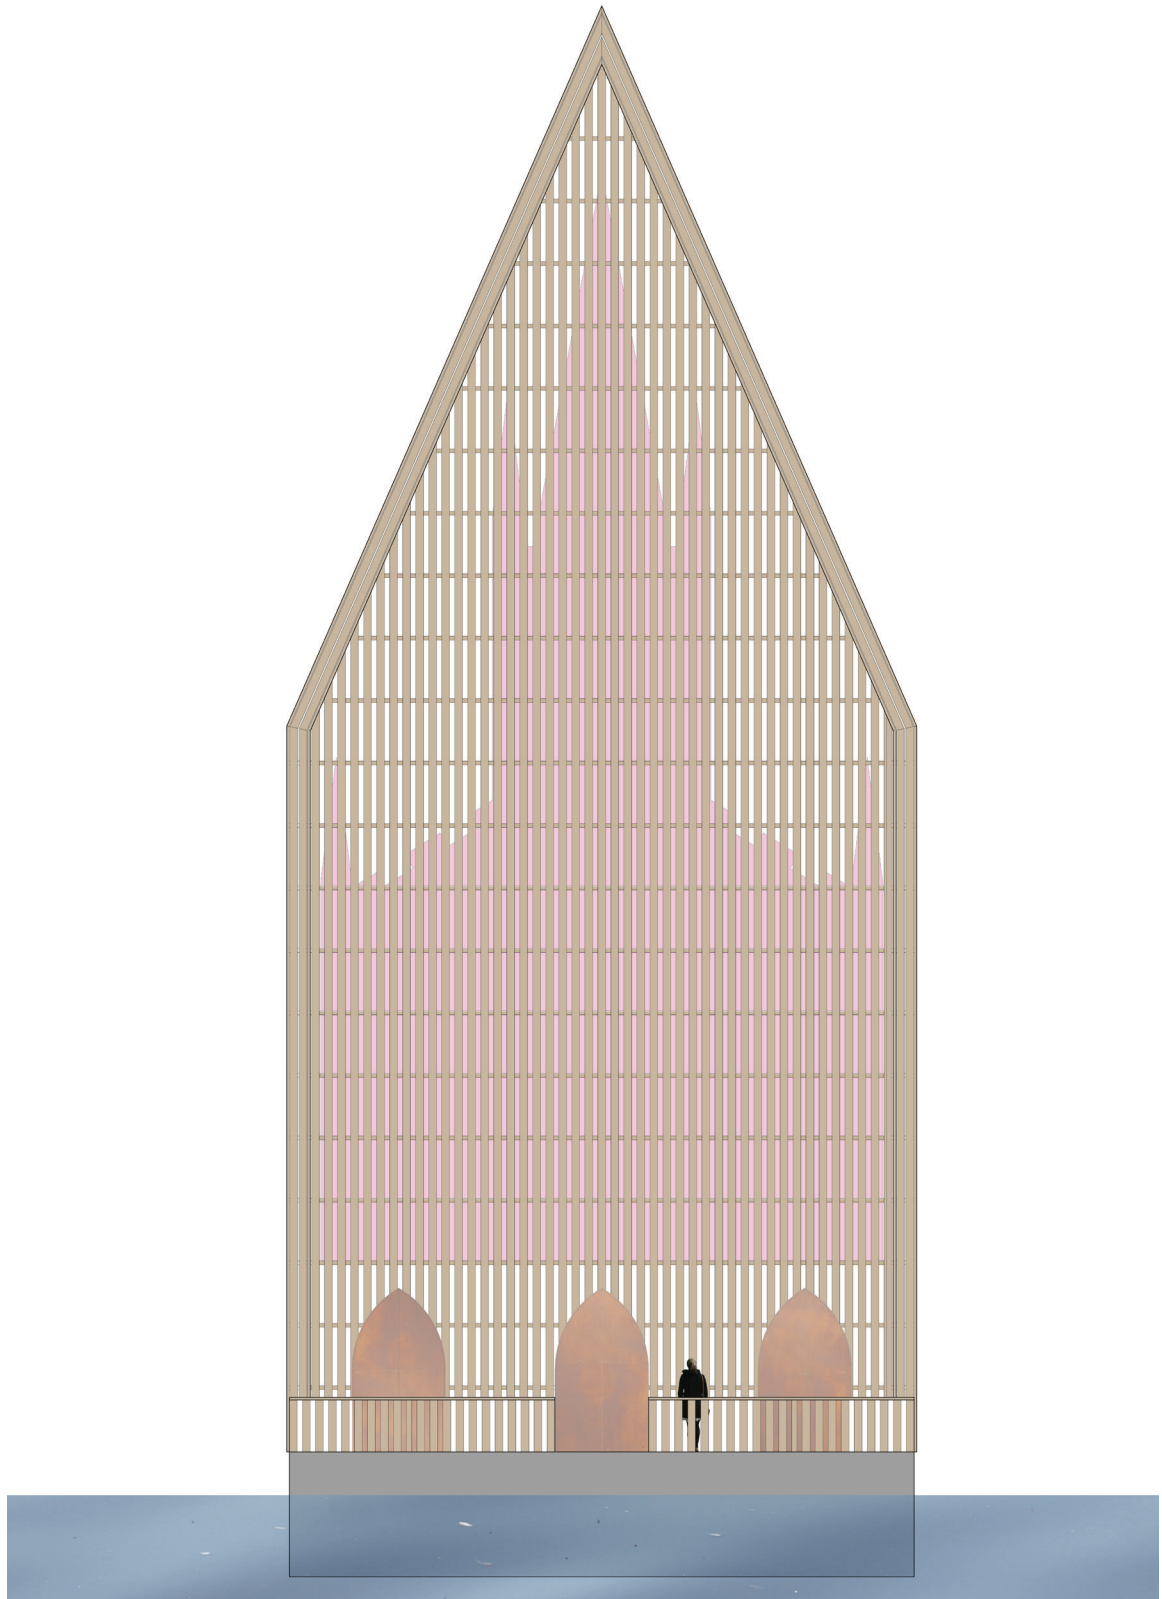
Floating Church of the Redeemer Reconstruction Front Facade.
